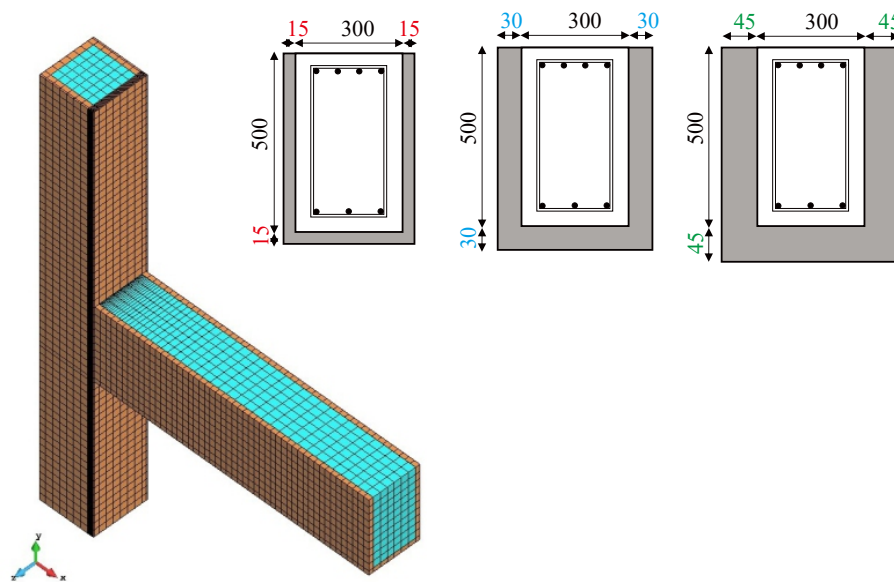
Cross-sections of strengthened joints with HPFRC layers.
